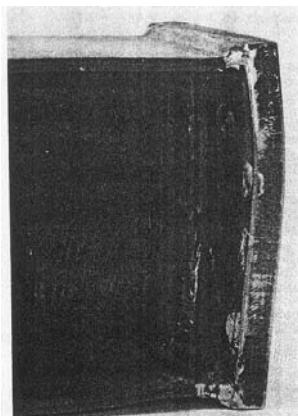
Short end-plate connection for an I-beam where yielding of beam web has permitted overall bending of end plate
